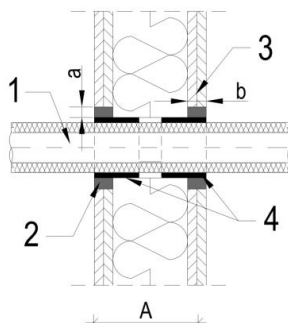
Pipe in flexible wall  $A \geq 125$  mm
